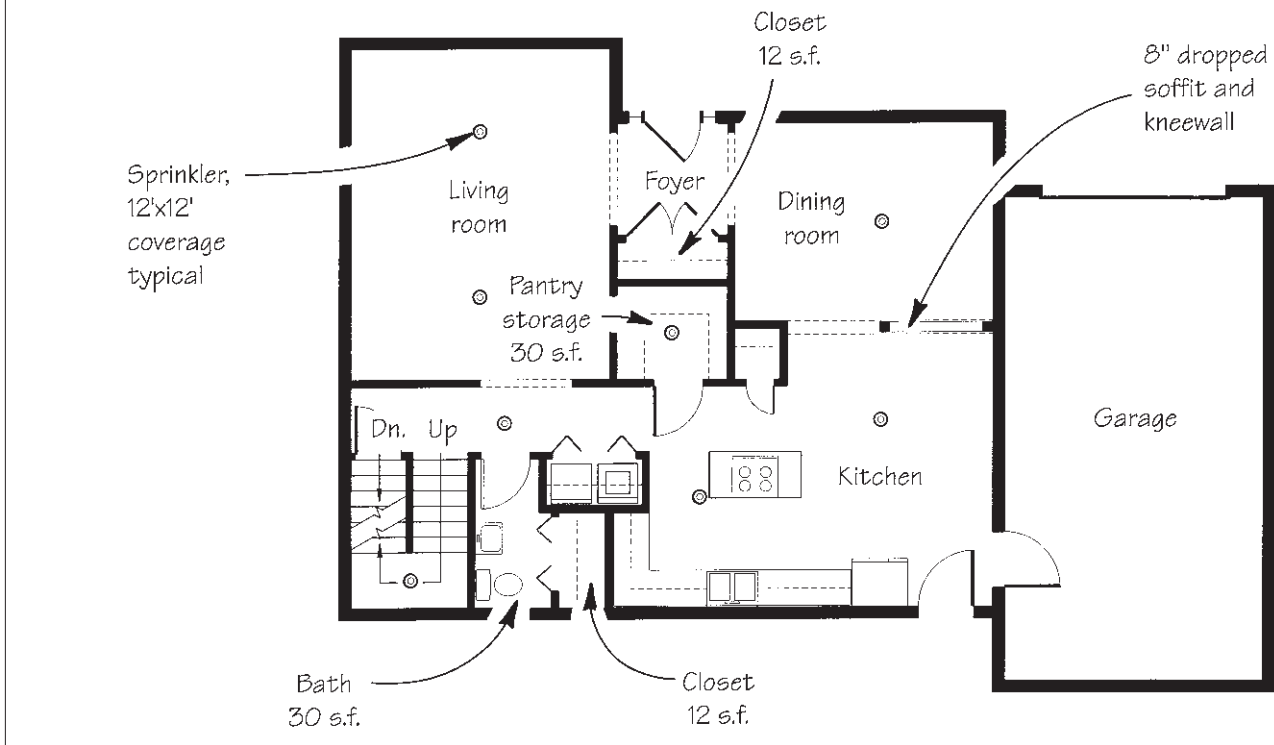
The goal in sprinkler layout is to provide complete coverage with the fewest sprinklers and the least amount of piping. Certain spaces are permitted to go without sprinklers, including small closets and bathrooms, attics and crawlspaces not used for storage or living, garages, and the entrance foyer in homes having another exit.
